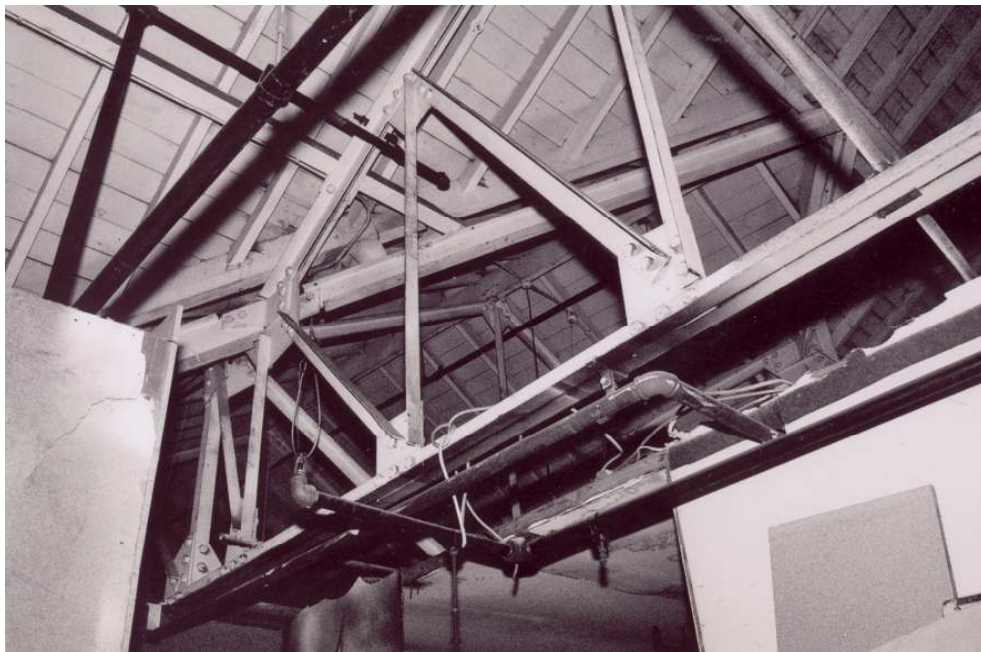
Fourth Floor. Room 13 (1932 building), steel frame roof, looking north-west.
